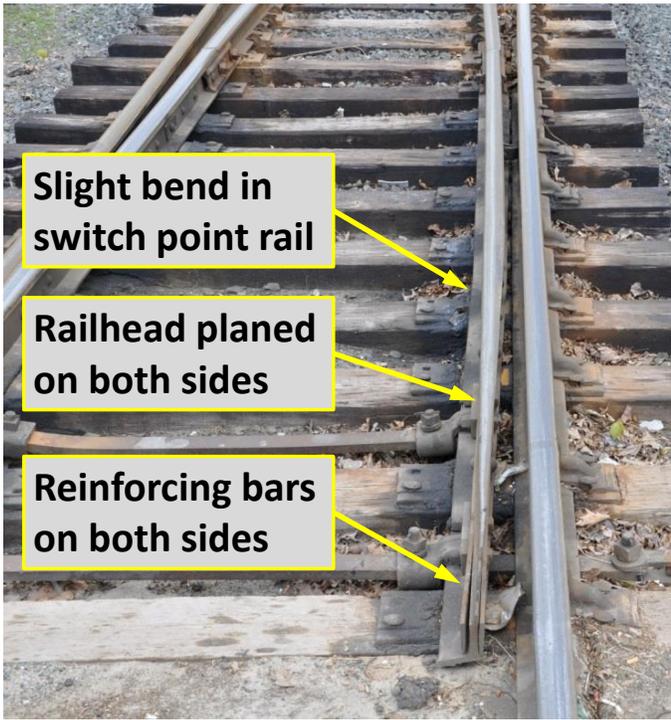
Switch Point Rail Bend *Van S. Fehr photo
